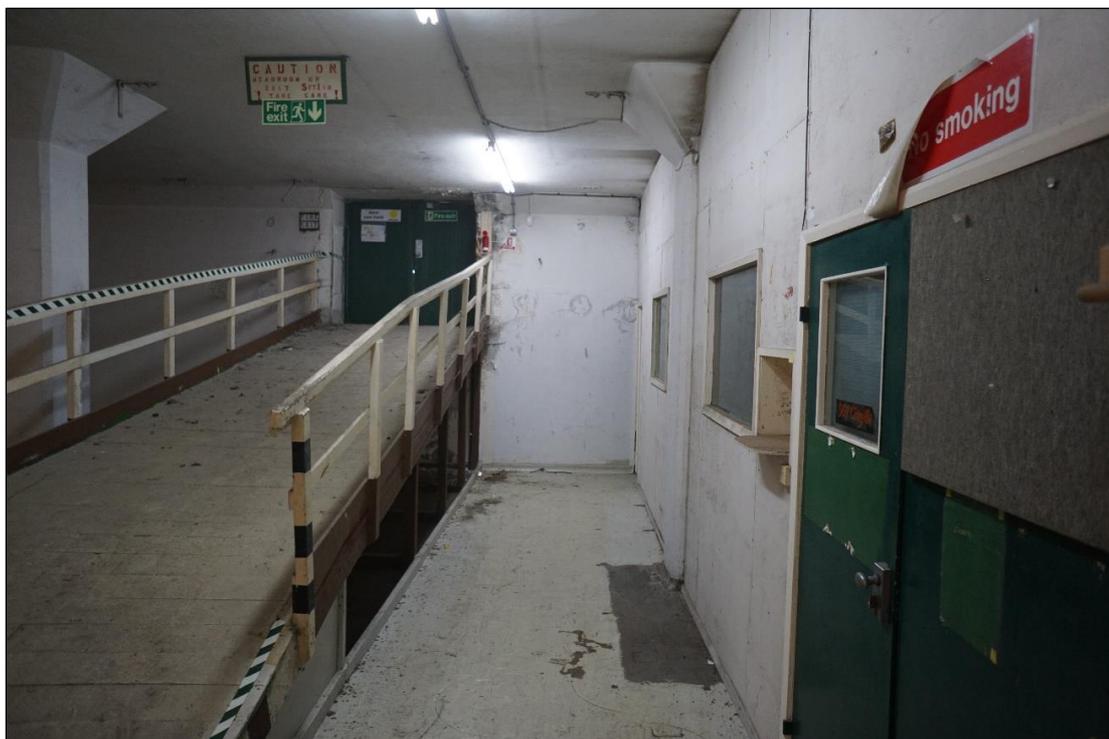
Ramp leading up to the fire escape on the eastern wall with partitioned room to the right
